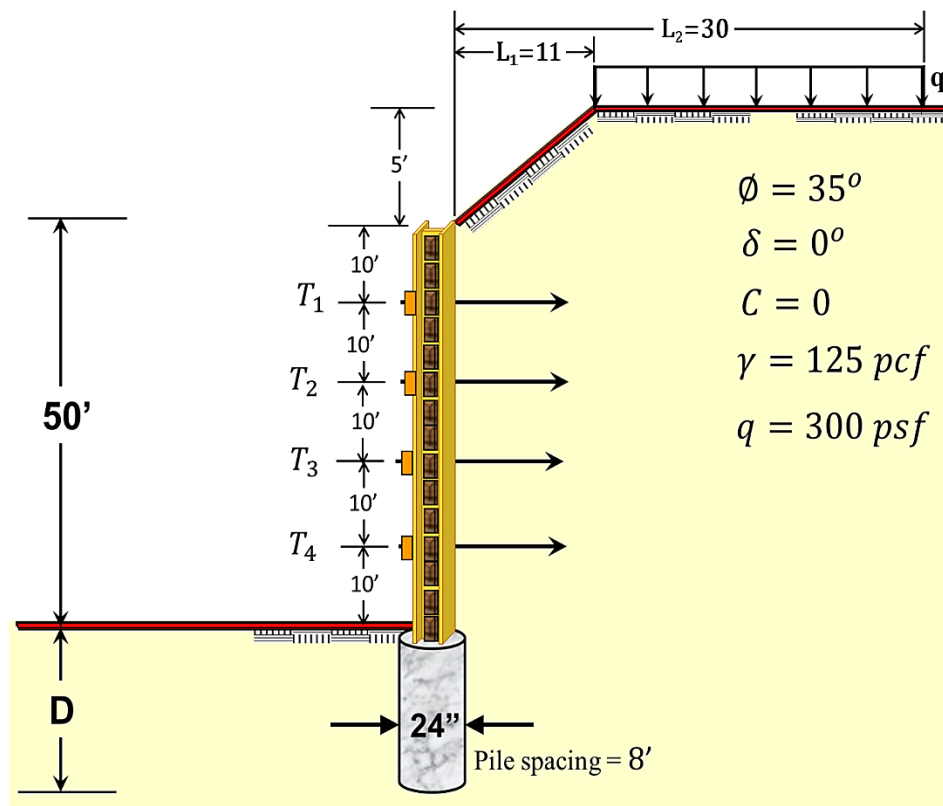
Multiple Ground Anchor Soldier Pile Wall, Example 8-2
